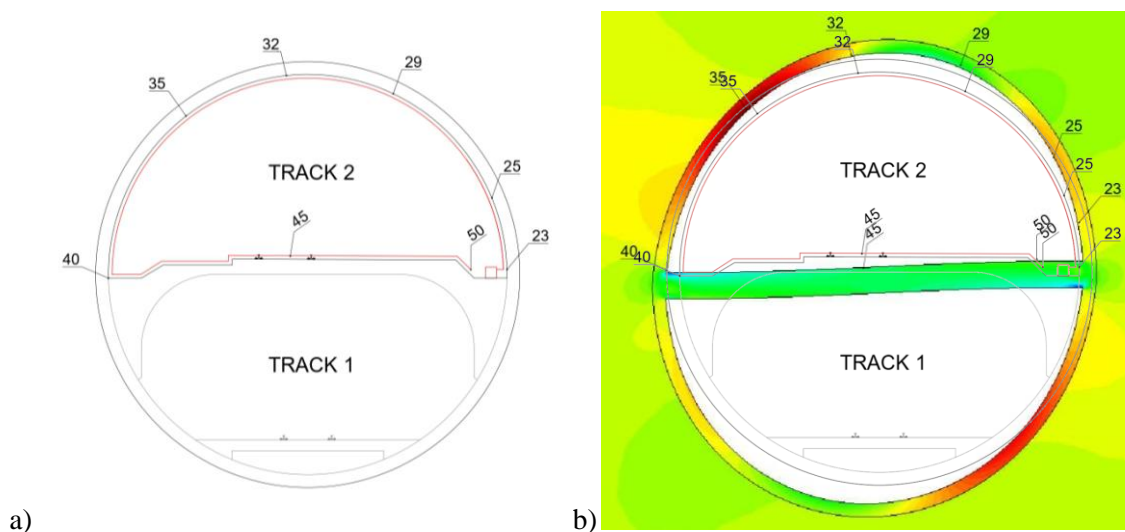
Representative points in a) tunnel cross section and b) structural loading model
